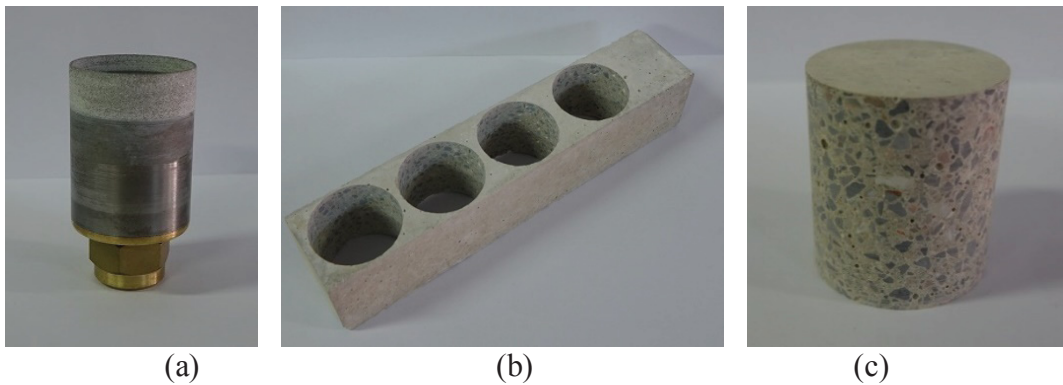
(a) Core Drill, (b) Concrete Prism, (c) Concrete Specimen
